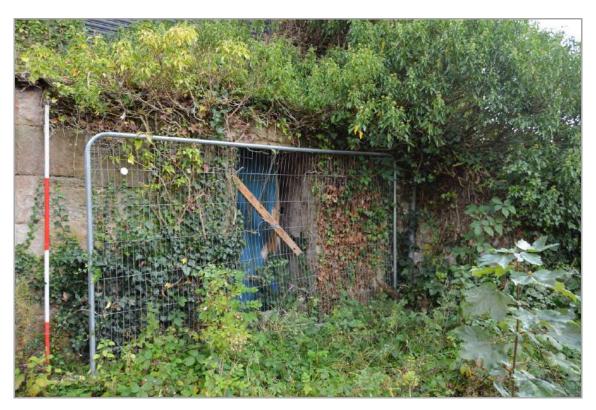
Extension structure in front of west elevation (facing south east). Scale 2m.
